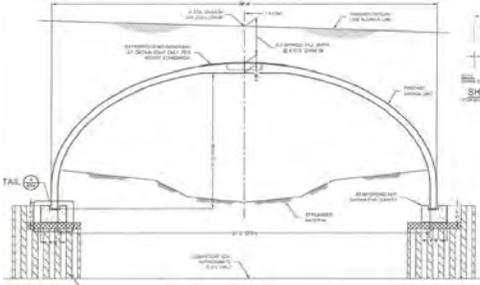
Structure Alt. 3 – Contech BEBO Arch
